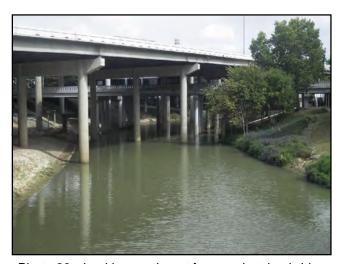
Looking northeast from pedestrian bridge at I-45 Crossing of Buffalo Bayou West 1
